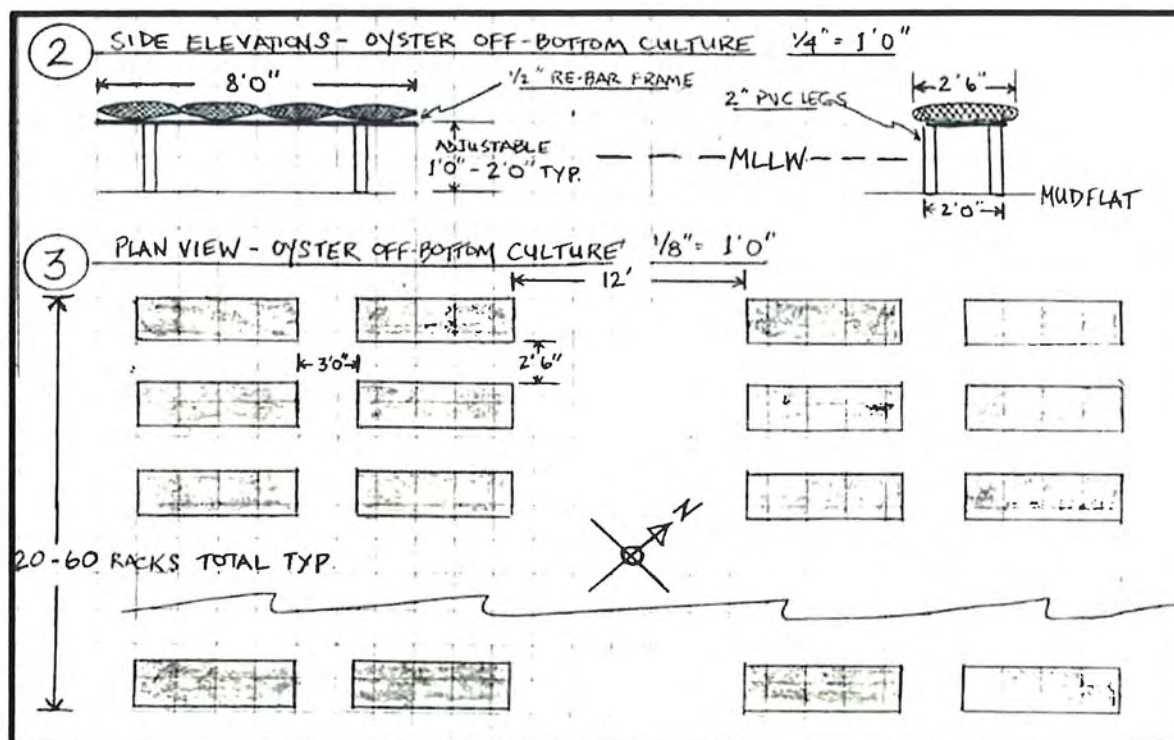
Typical Off-Bottom Racks-on-Pipe Layout
